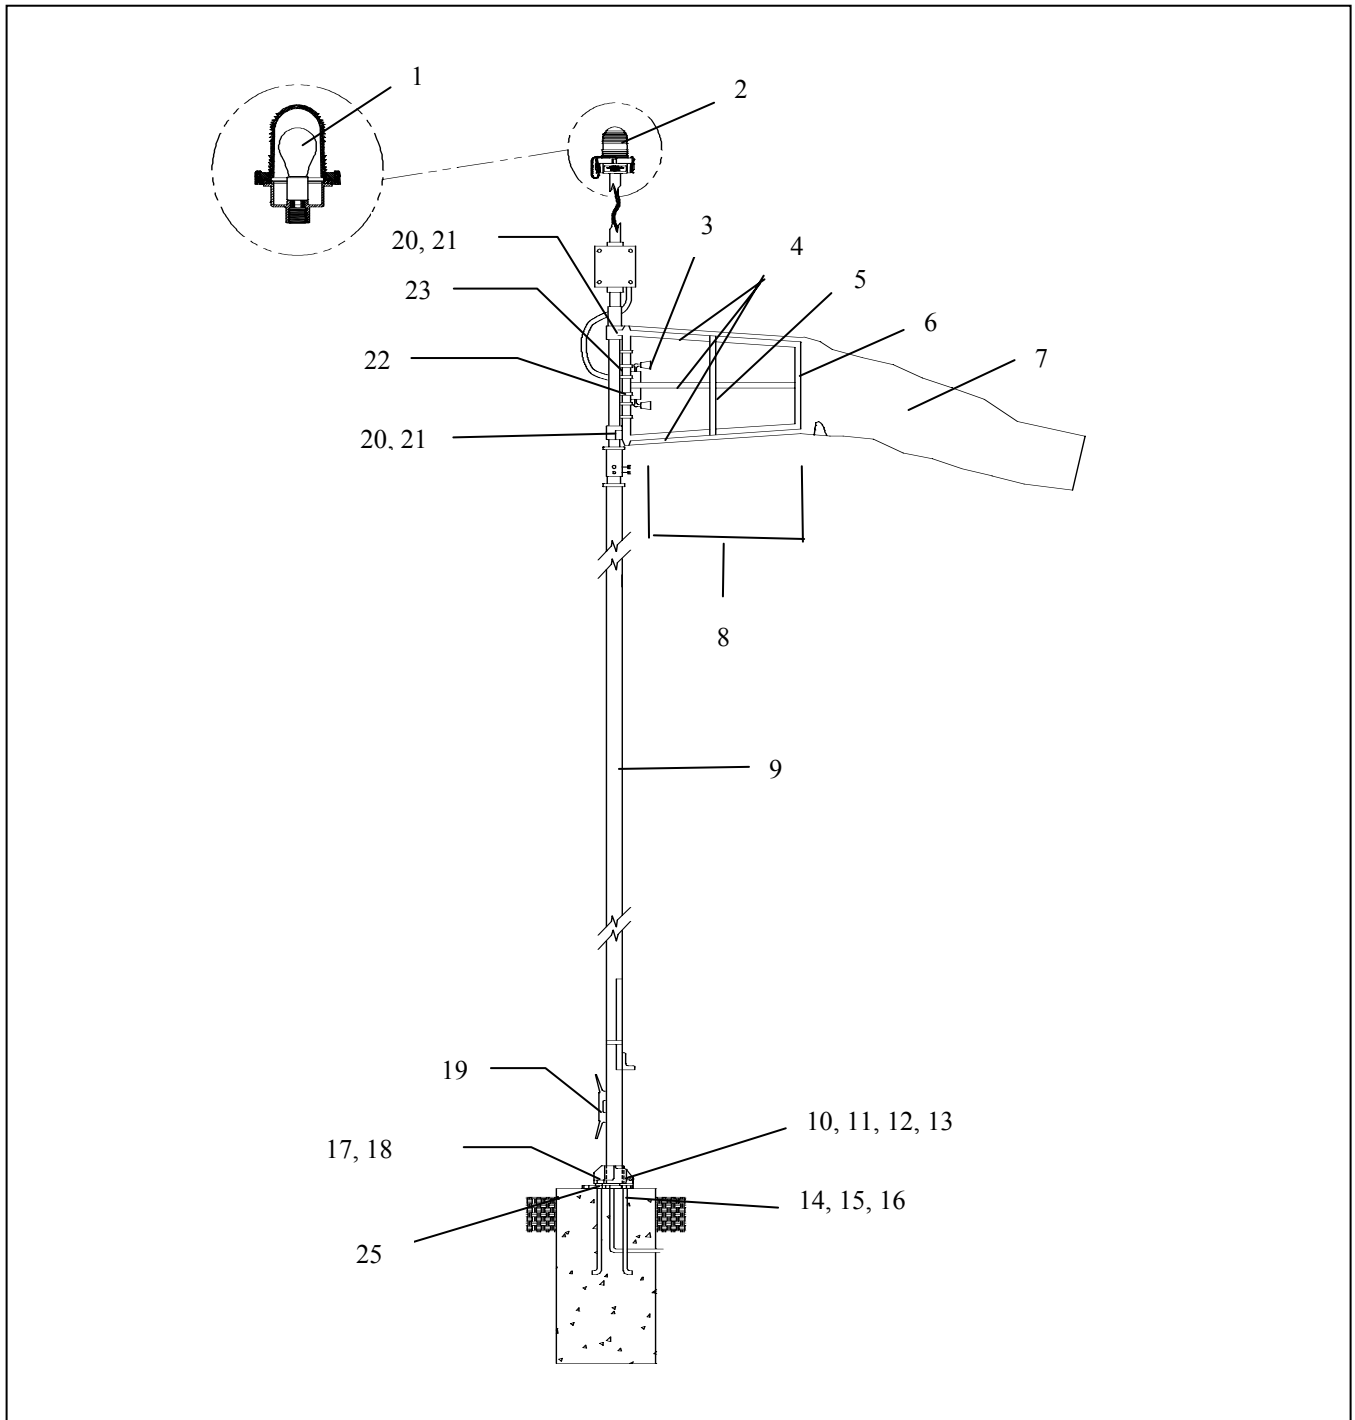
L-807 Wind Cone (With Internal Lighting Assembly and Obstruction Light)
